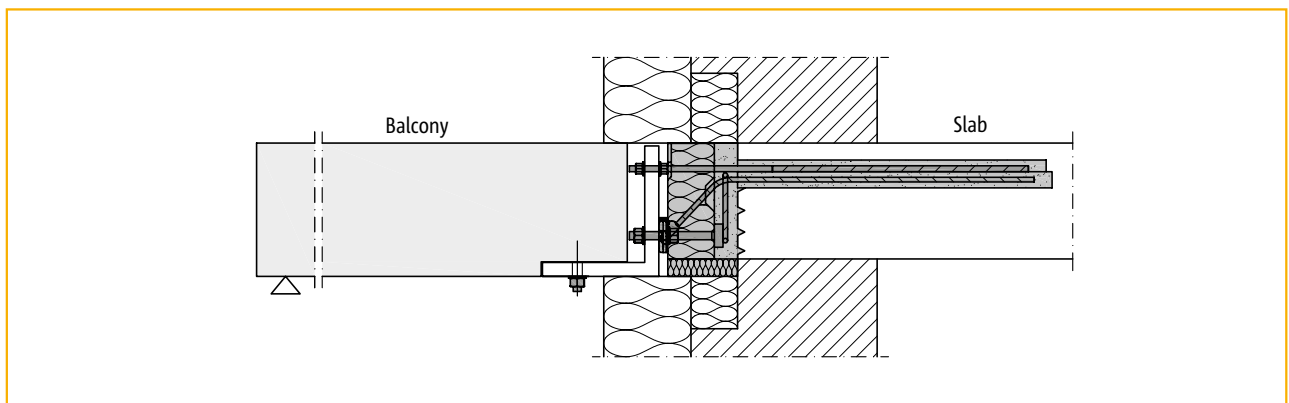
Connection of a prefabricated balcony on an existing floor using type RKS, supported structure
